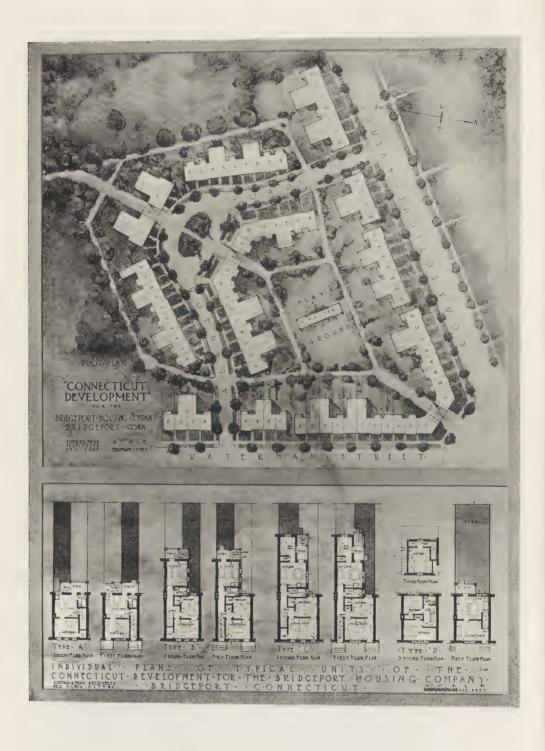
GENERAL PLAN AND TYPE PLANS—BRIDGE-PORT HOUSING CO. DEVELOPMENT, BRIDGEPORT, CONN. SCHENCK & MEAD, ARCHITECTS.
